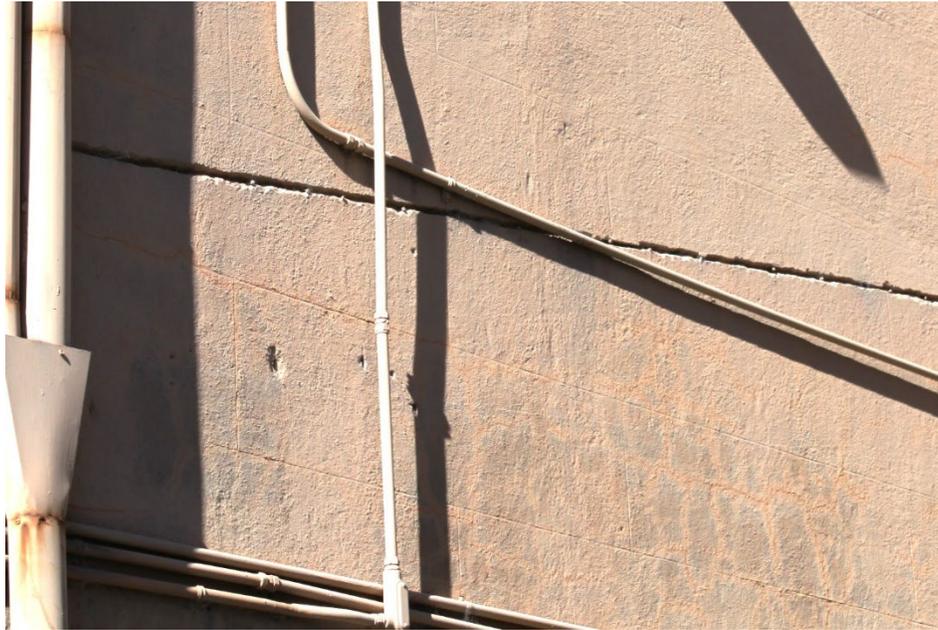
Ell, East Elevation. Scored stucco wall finish, 2023.
